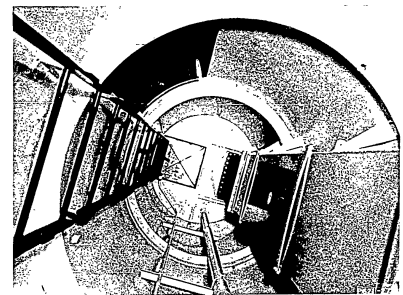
Looking up the torque tube from the rotary joint, showing waveguide going through torque tube hatch and ladder for access between pedestal and outside top of hub.
